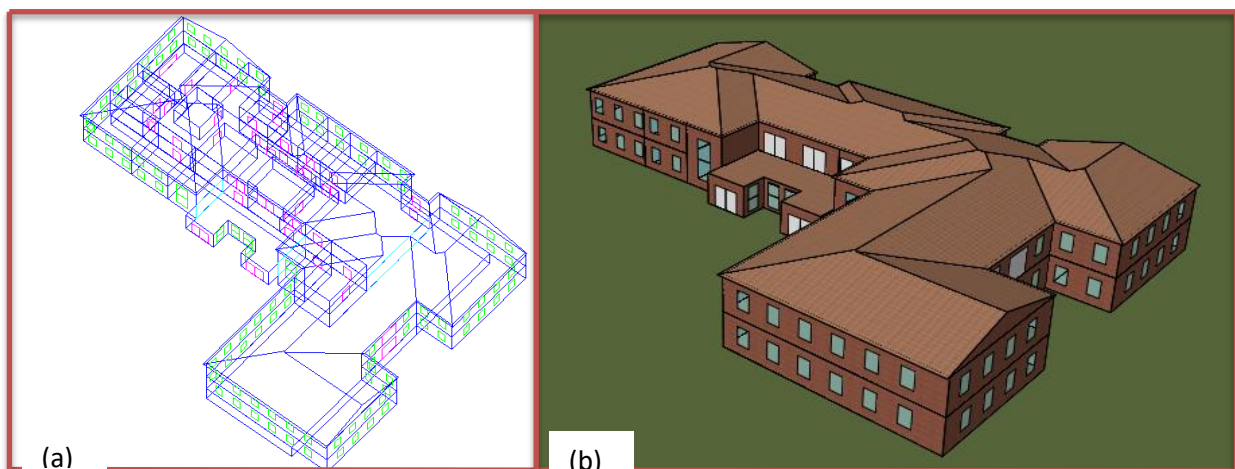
The Planes Building complete model in (a) frame and (b) rendered views
